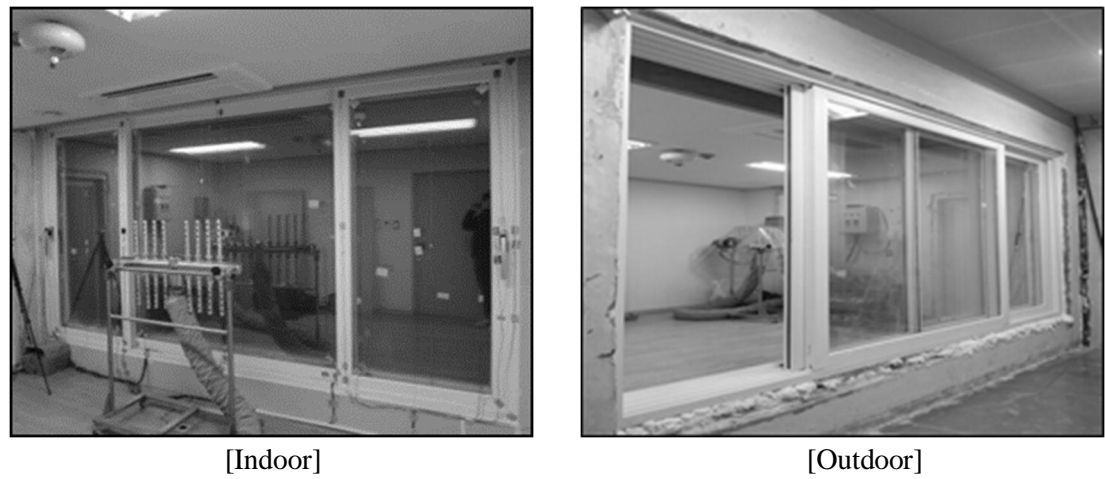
Full-scale mock-up laboratory: indoor(left), outdoor(right)
